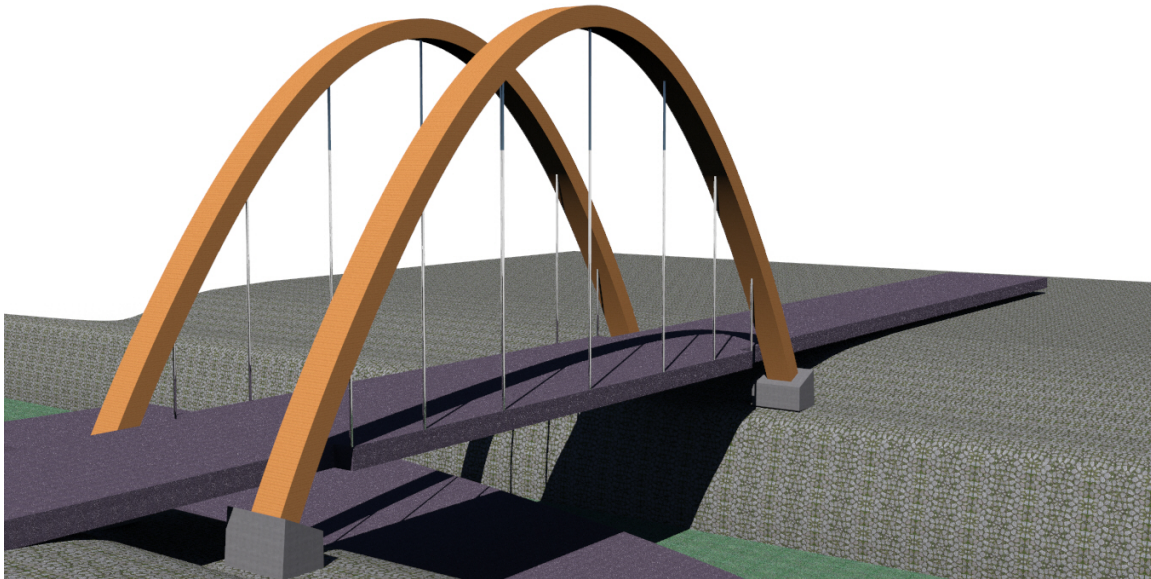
Arch bridge carrying the deck with compression arches and tension bars.
